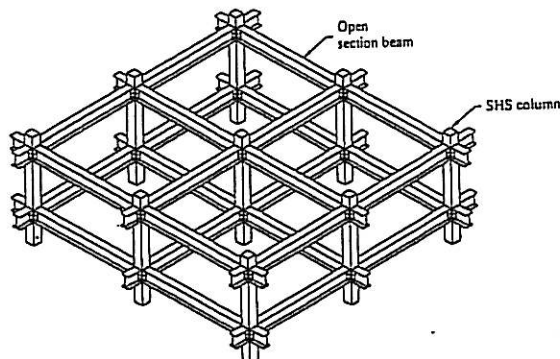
Typical structural system of multi-storey frames with open section beams and SHS columns
